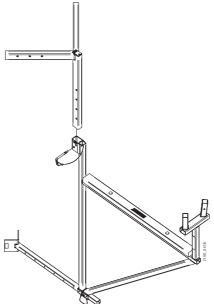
Assembly of Corner Platform on Corner Attachment or Clamp.
